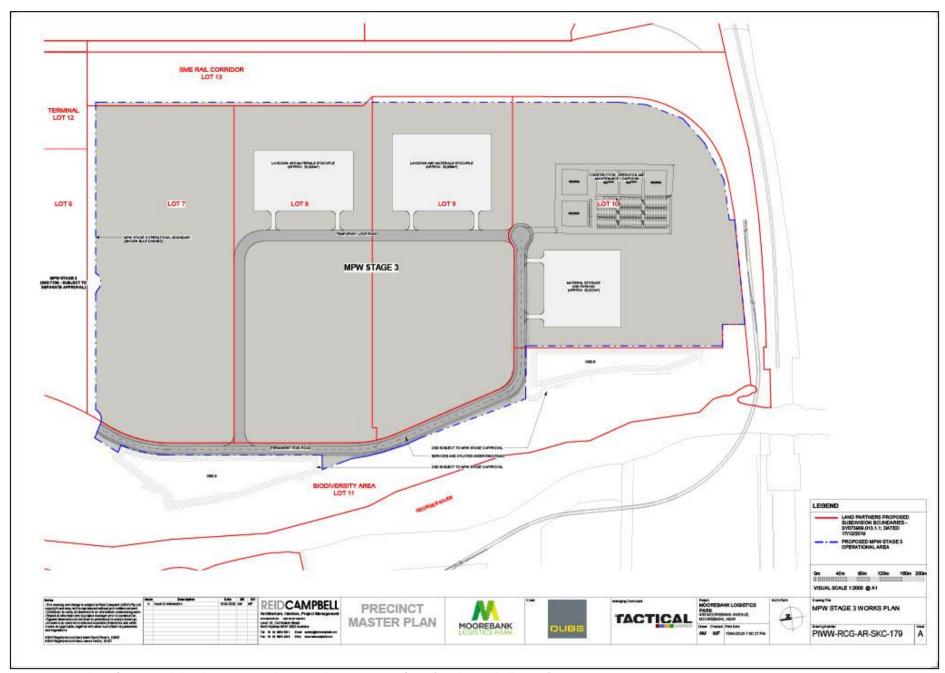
Plan of proposed development works in southern portion of site (Reid Campbell, 2020).
